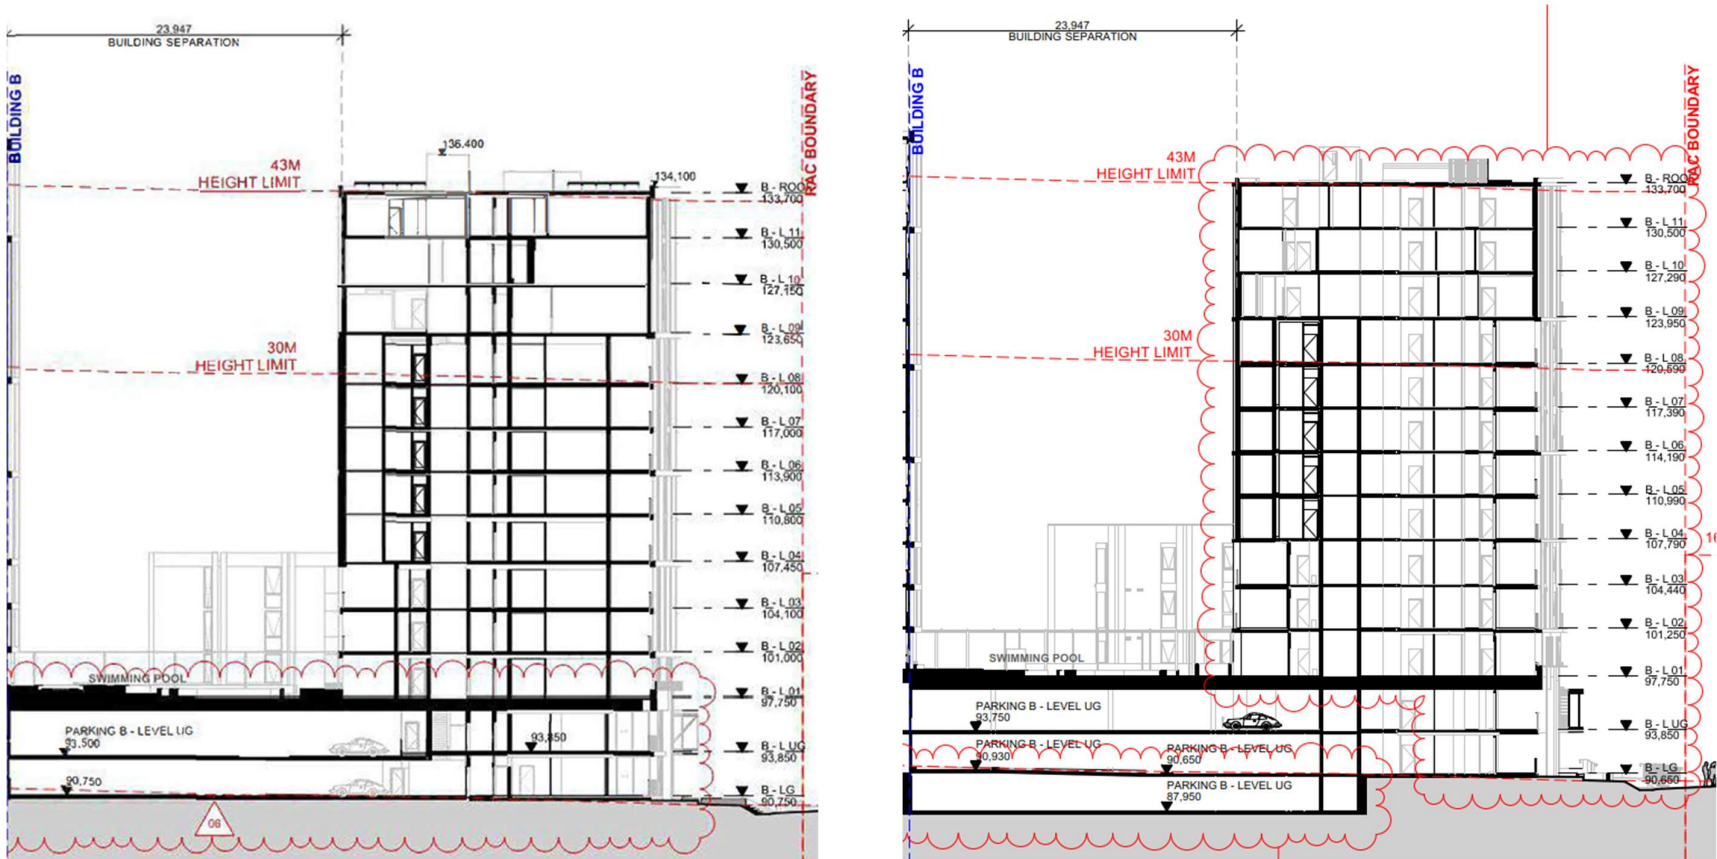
Approved and Proposed E-W Section of Building B (3 of 5)
